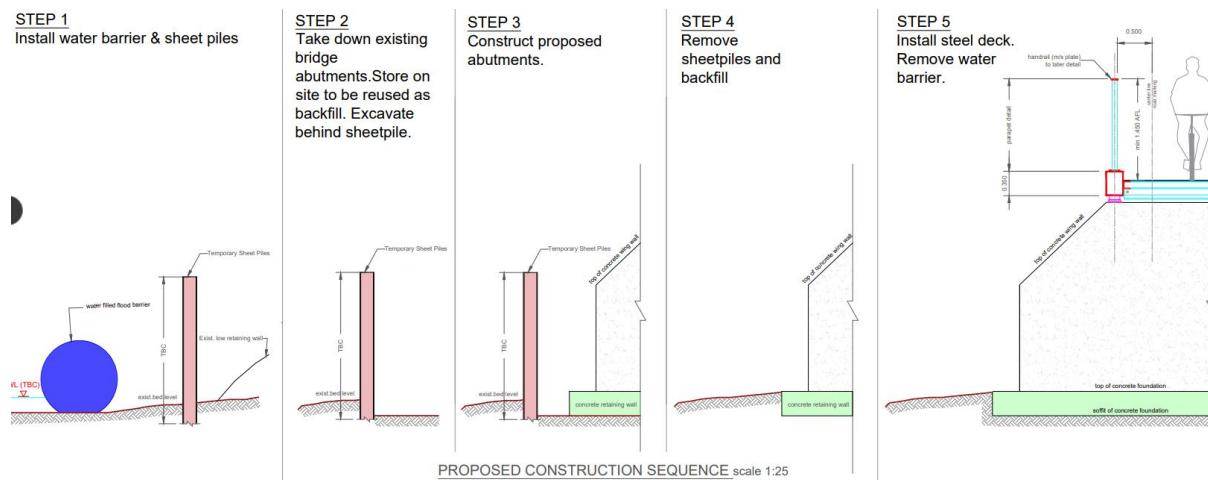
Proposed construction sequence for Bridge 1 (refer to drawing RHA-XX-DR-S-SP0012)
